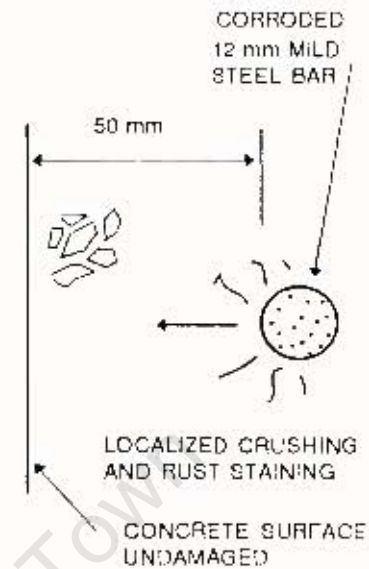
Corrosion of Steel in Beam, Columns and Walls
